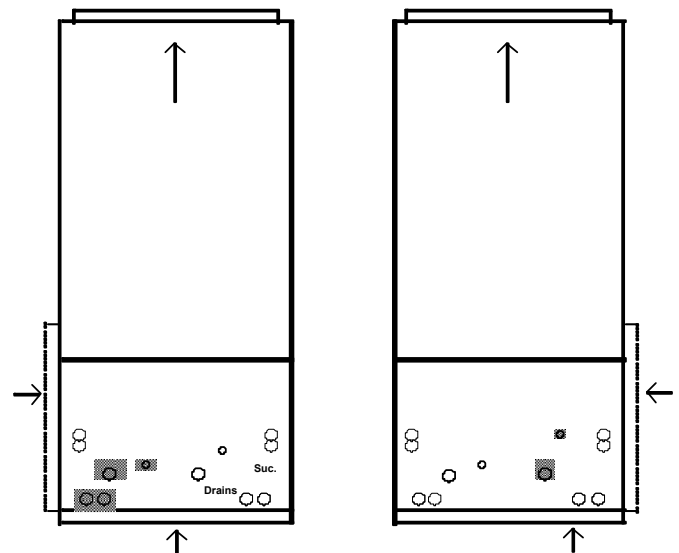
Air Handler in vertical position. BVRMB7230S001 models are side air return capable. Side return field installed filter rack available as an accessory. Side of cabinet must be cut to obtain side air return access.
